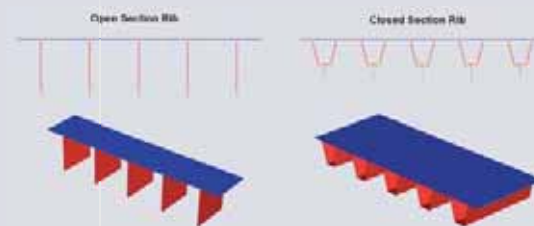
Transverse Beam models used to work out local bending stresses and ranges.
